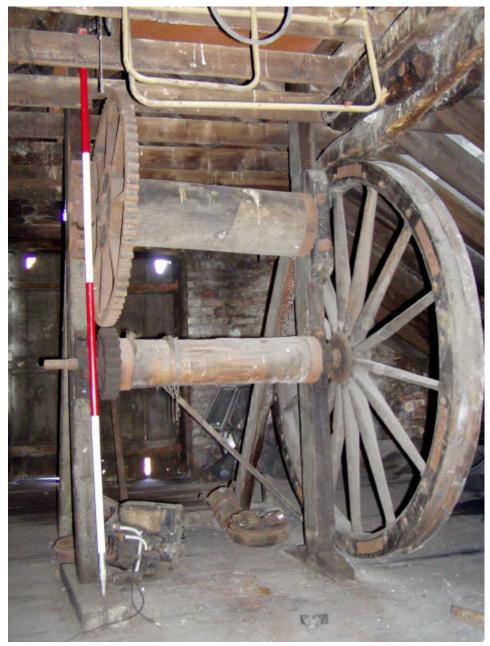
Detailed Shot of Winch Mechanism on the Third Floor
